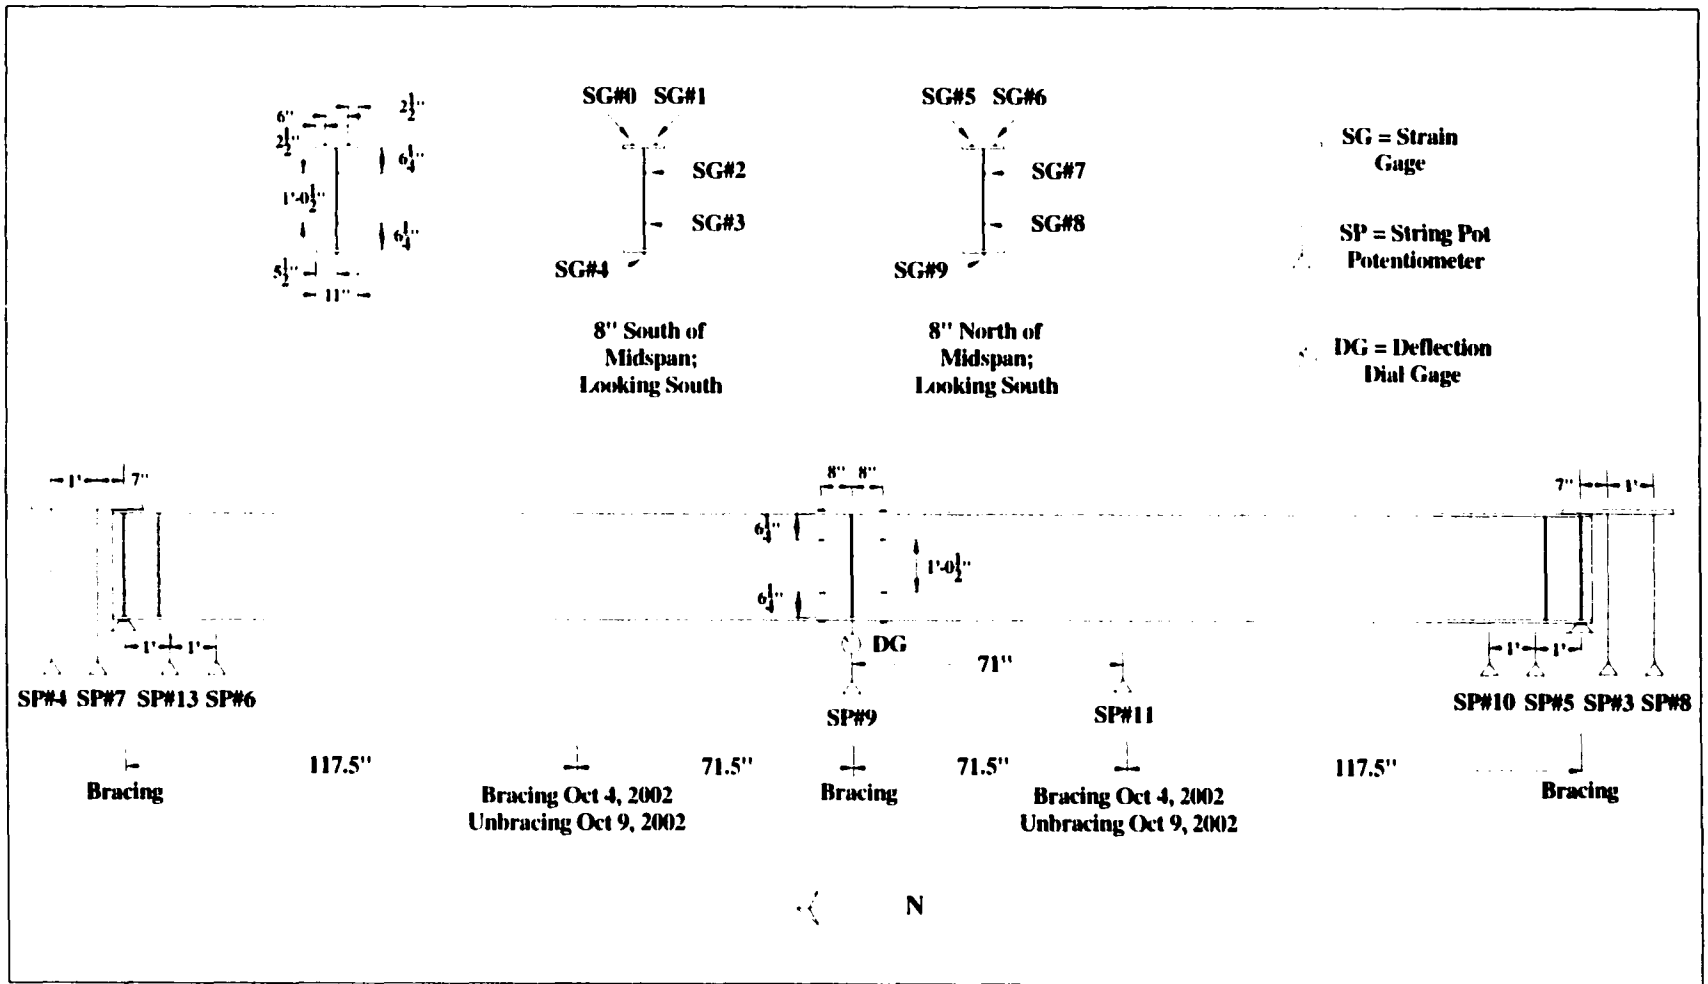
Specimen #4 - Instrumentation locations
